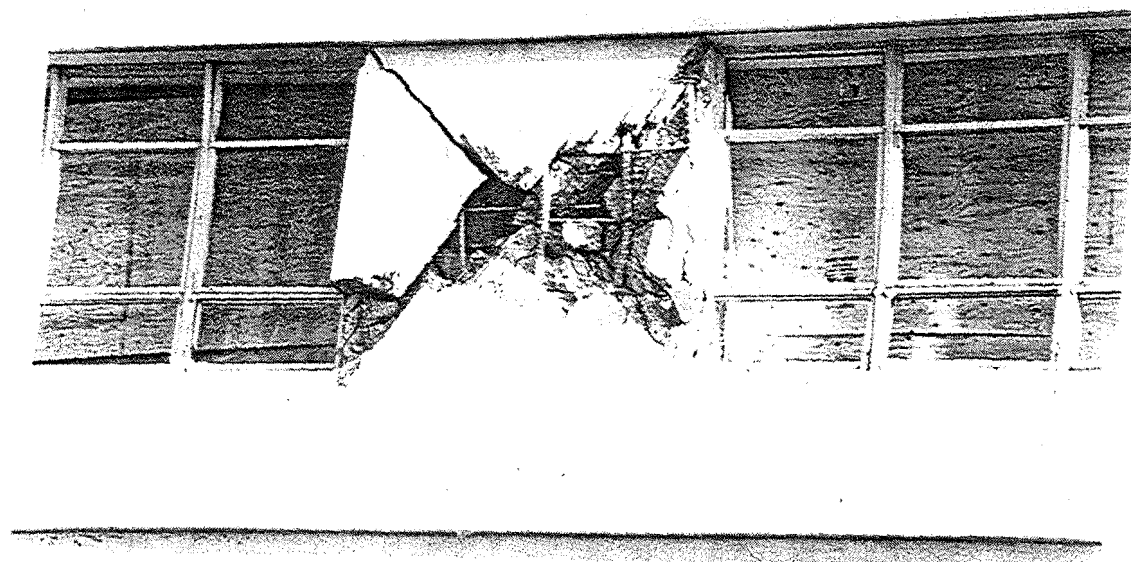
Shear failure in the reinforced concrete floor piers, St John's Hospital, Northridge earthquake 1994[B4], photo courtesy of D Bull.
